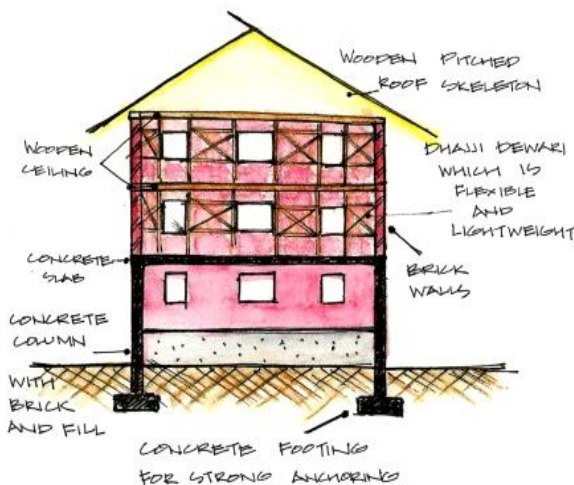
Schematic section showing mix of modern and traditional construction techniques for new constructions
